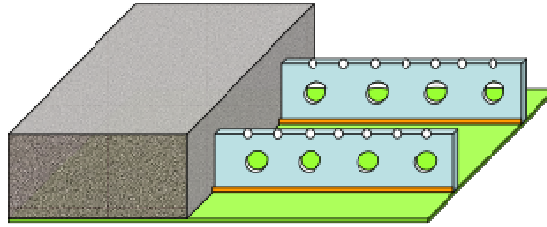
The schematic of flat steel plate-concrete composite slabs
